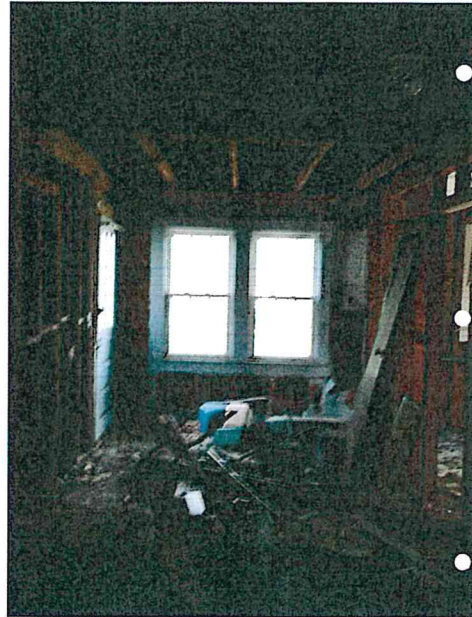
EXHIBIT B: INTERIOR PHOTOS OF SUBJECT SITE (CONT)
